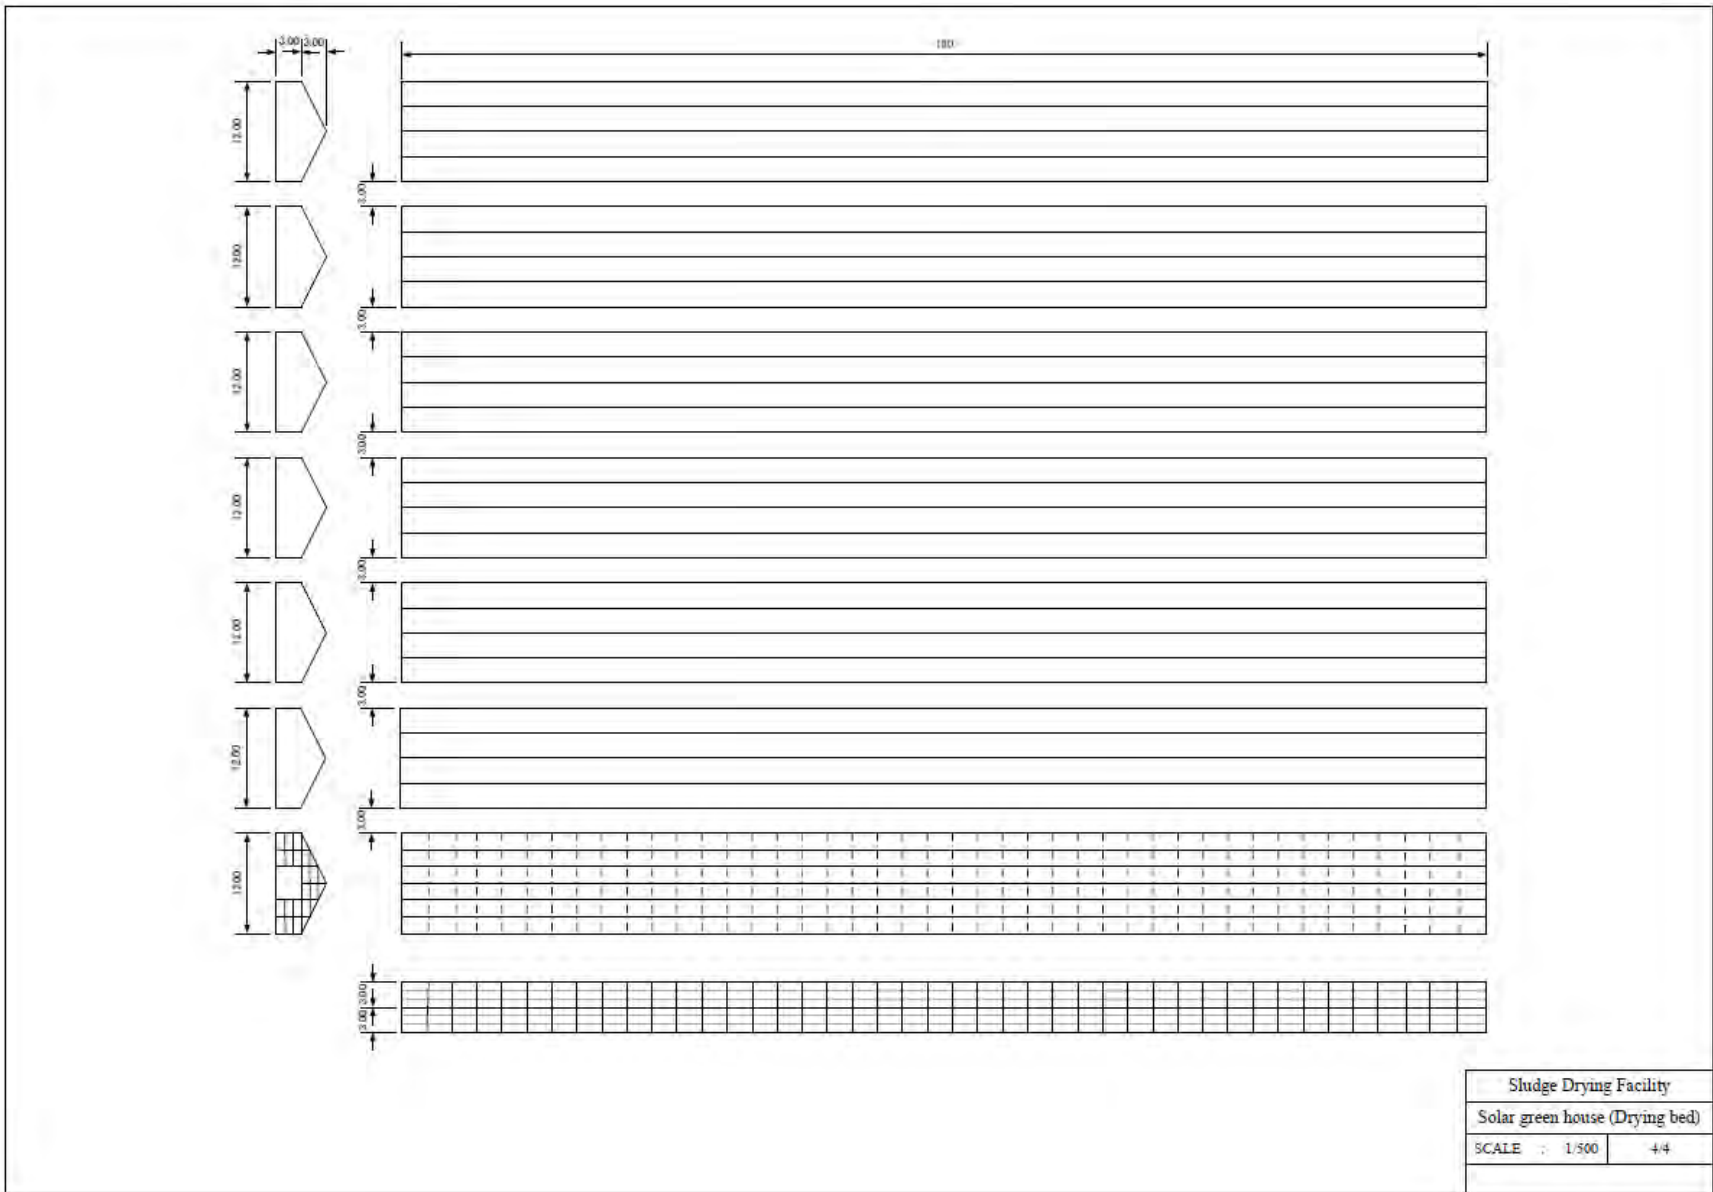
Plan of the Solar Green House (Source: JICA Study Team)
